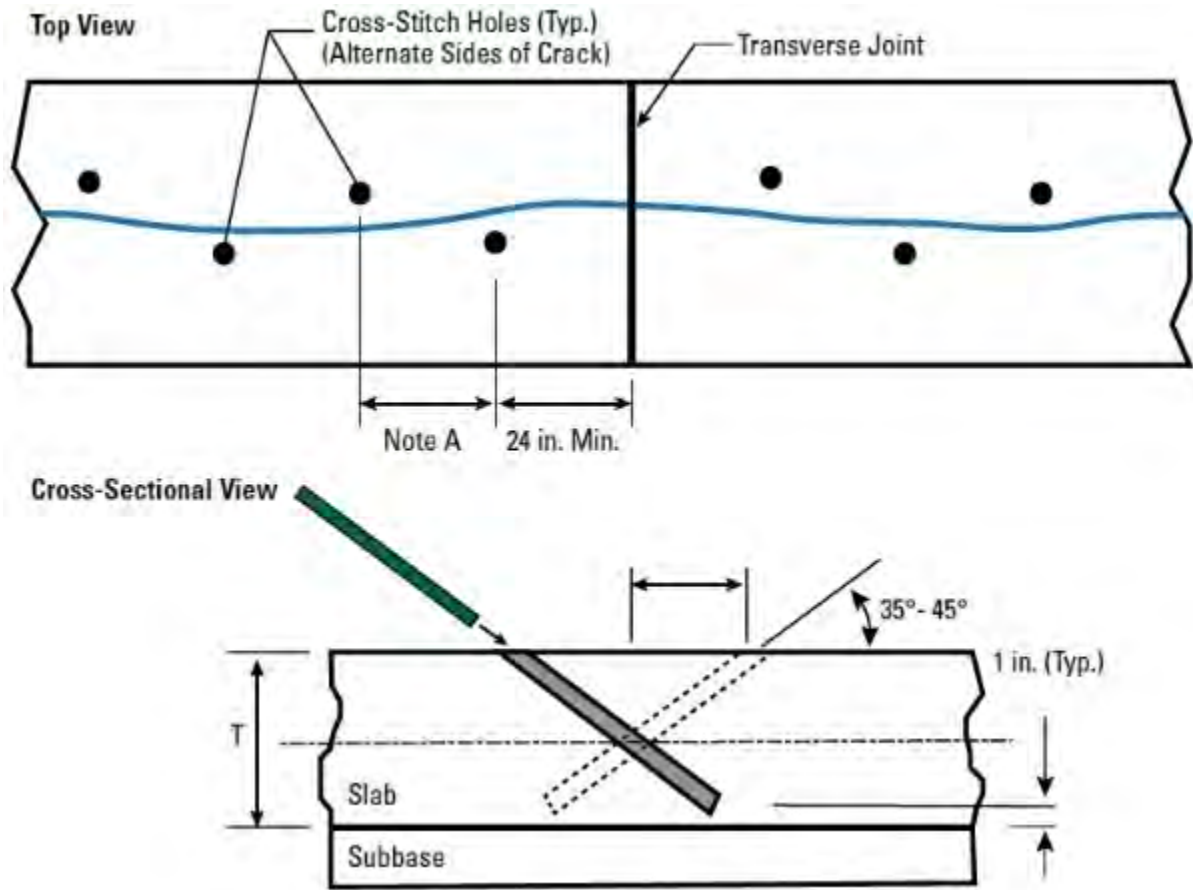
Schematics of cross-stitching on CRC pavement (adapted from IGGA, 2010).
